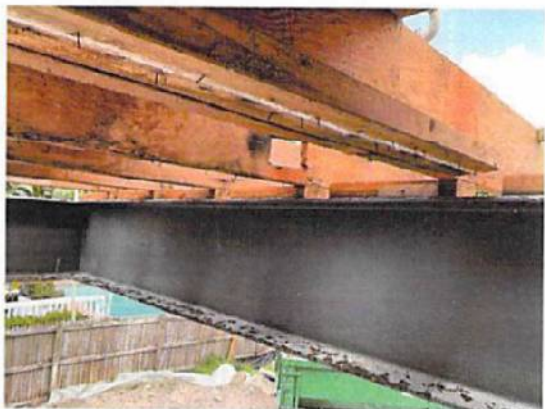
Typical structural damage and section loss at load bearing steel members
